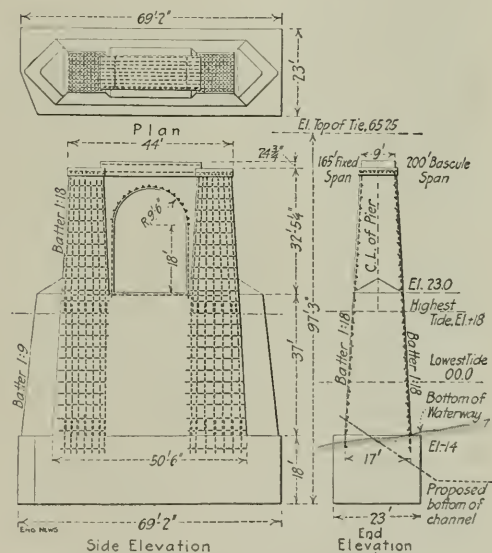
REINFORCED-CONCRETE REST PIER OF THE BRIDGE OVER THE SALMON BAY WATERWAY; GREAT NORTHERN RY.
